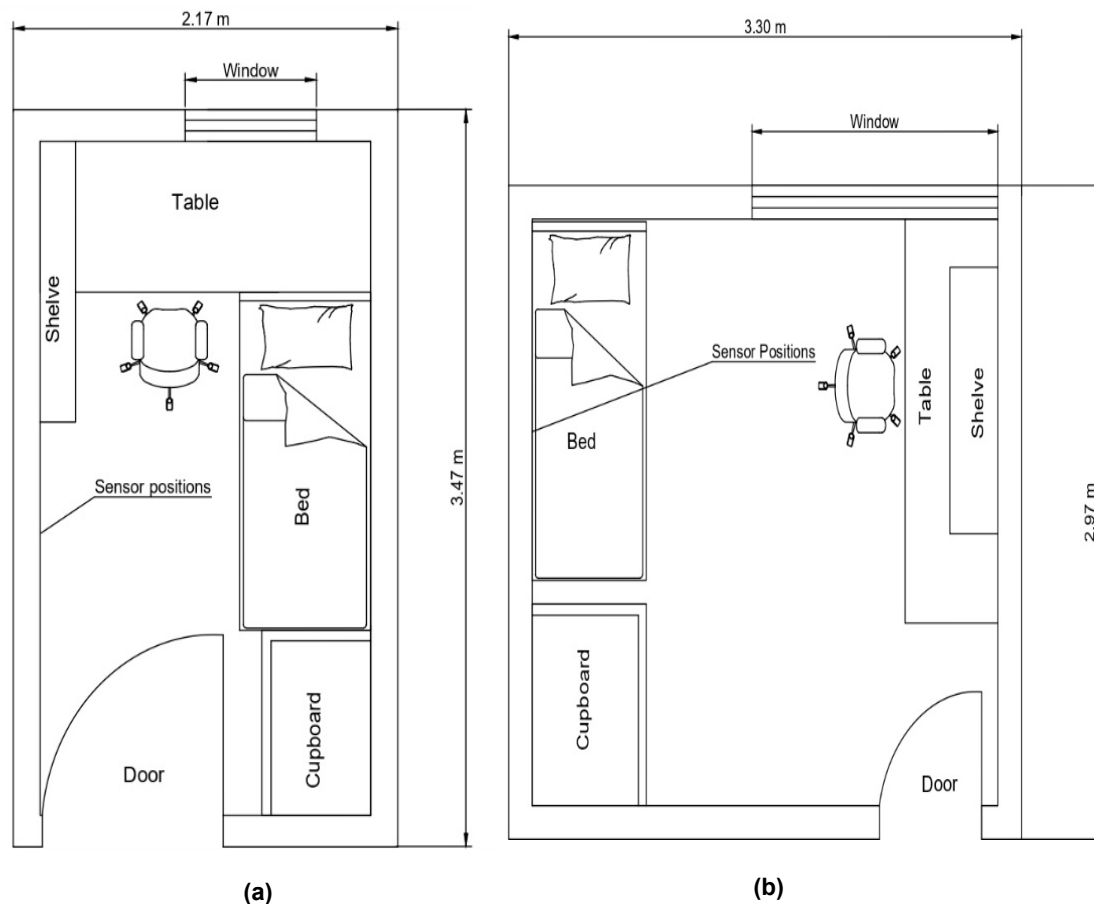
Plan of the rooms under study. (a) Small Room A and (b) Large Room B.
